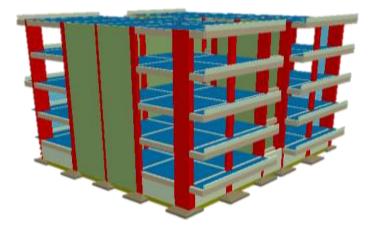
Shear wall arrangement for Figure 6.20 (e)
